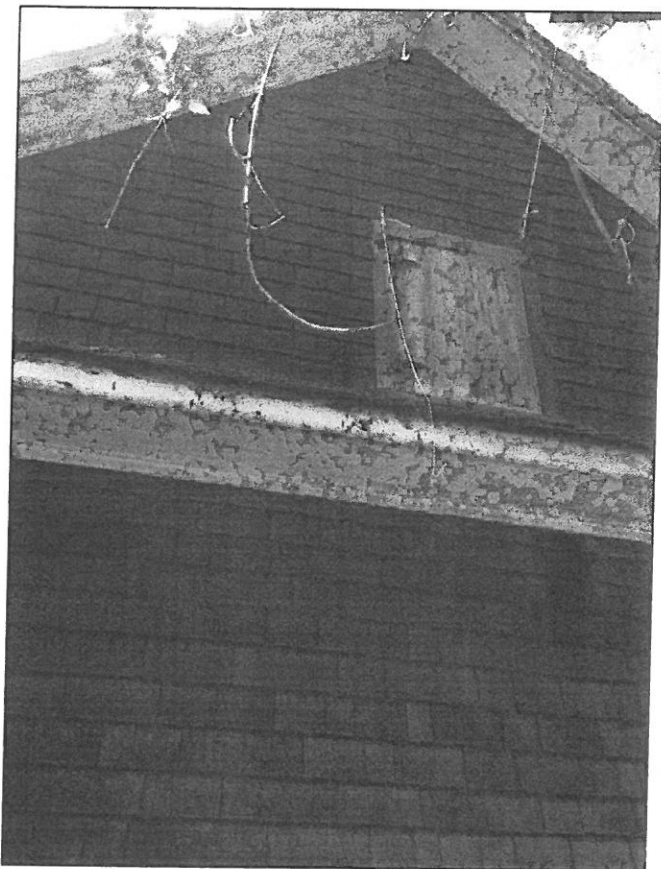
The upper east view of the carriage house. The condition of the wall shingles is very good. The fir soffits on both the first floor and second floor will need sanding and in some cases replacement. The small upper door is the only access to a storage area above the ice house.
